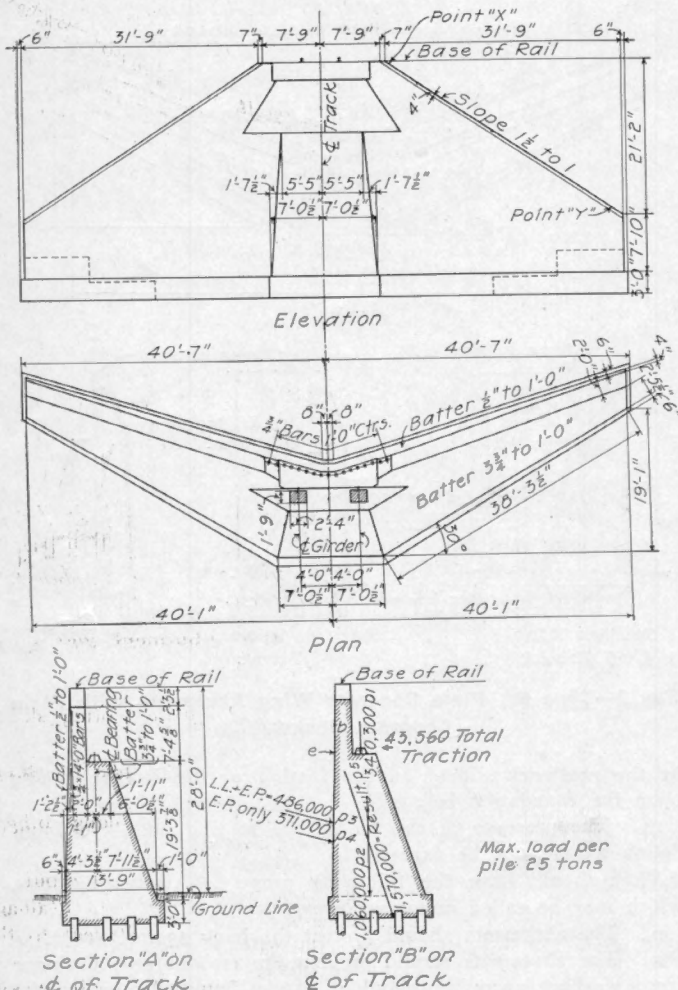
Type B₂, Plain Concrete Wing Abutment with Reinforced Backwall.
